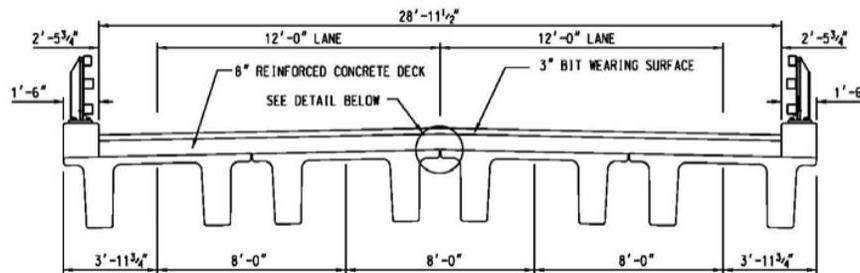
Bridge section with minimum width beams<sup>2,3</sup>
